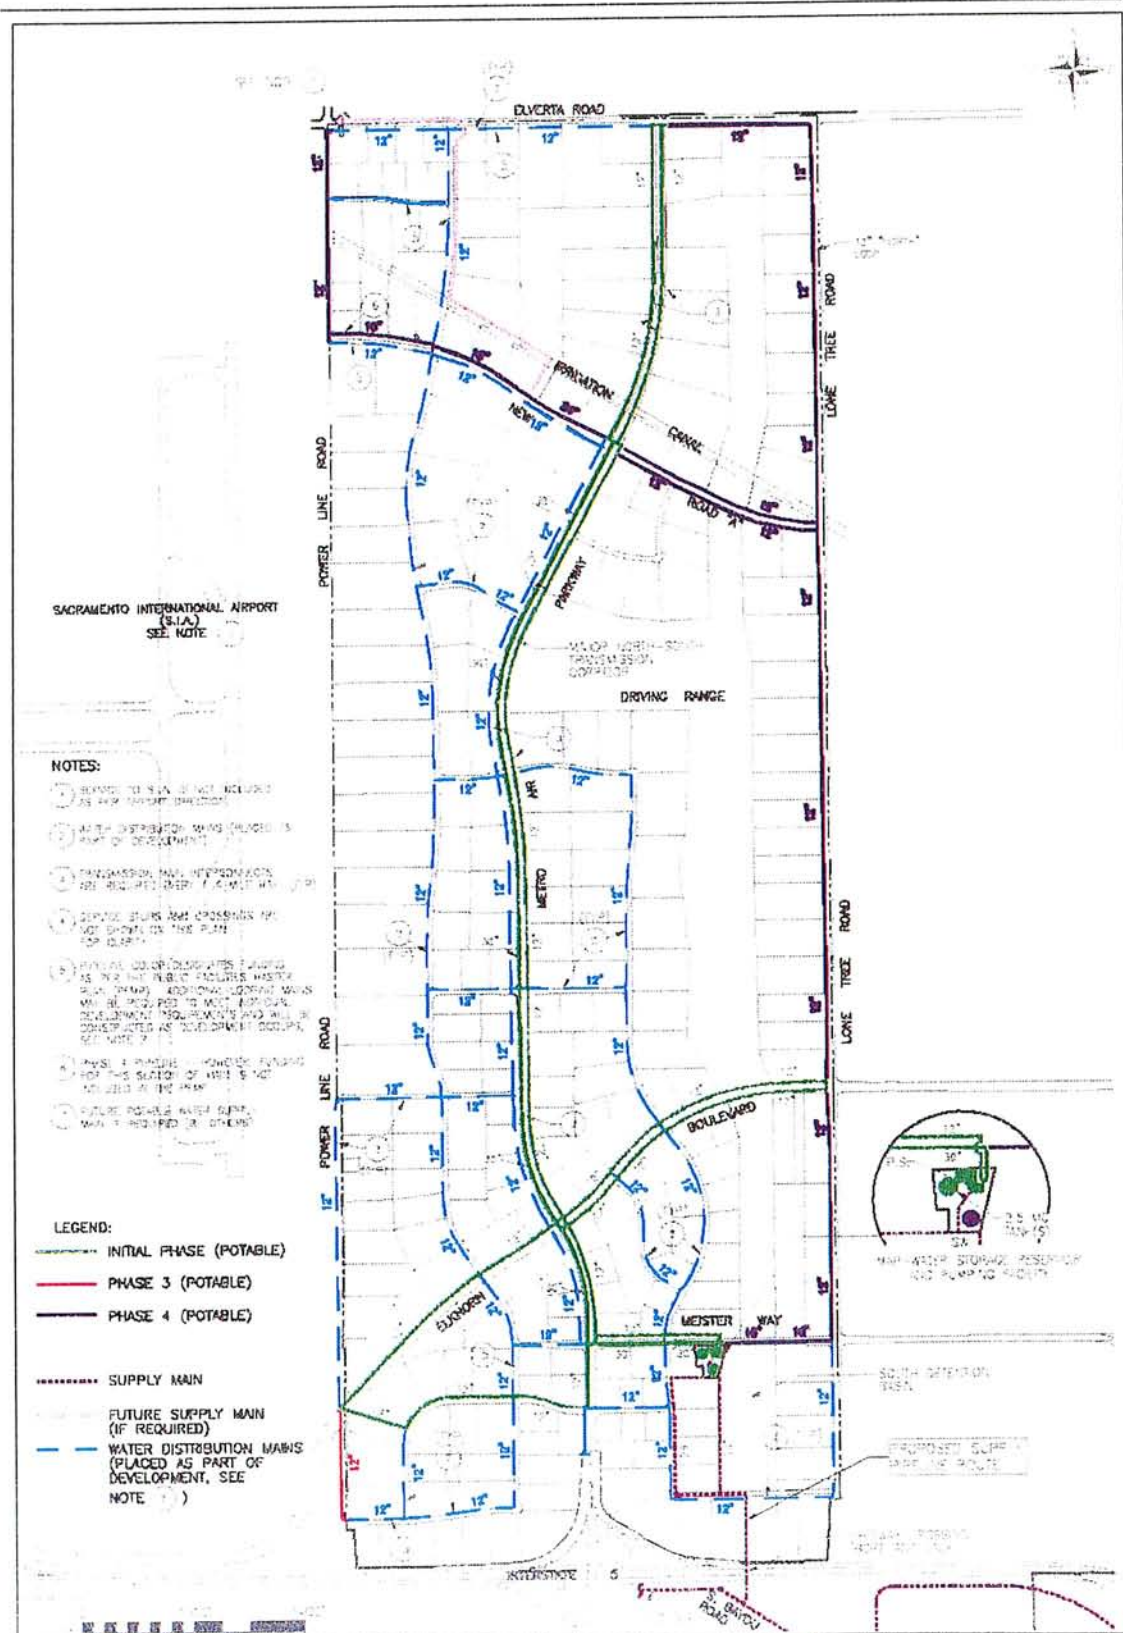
PHASE 6 - BUILDOUT WATER FACILITIES PLAN
